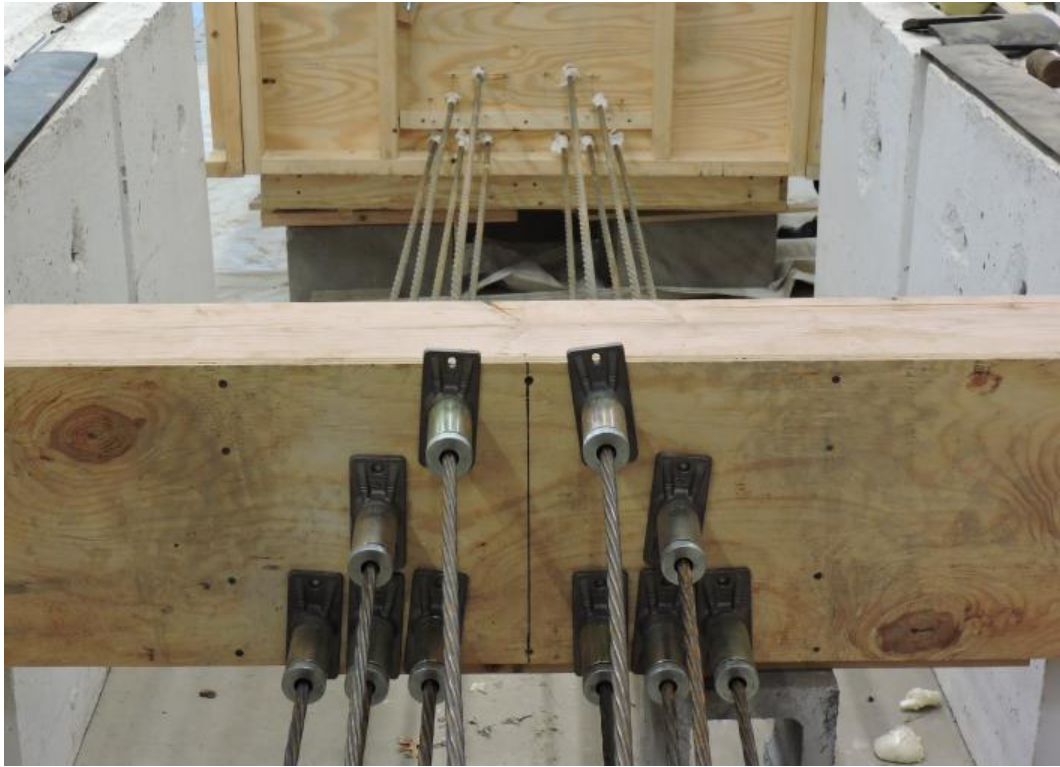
Bent Longitudinal Reinforcing of North End Repair
